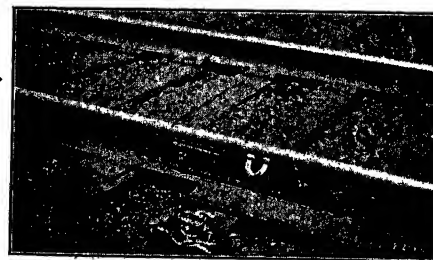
U-SHAPED FLAME WELD BOND ON THE DELAWARE, LACKAWANNA & WESTERN
